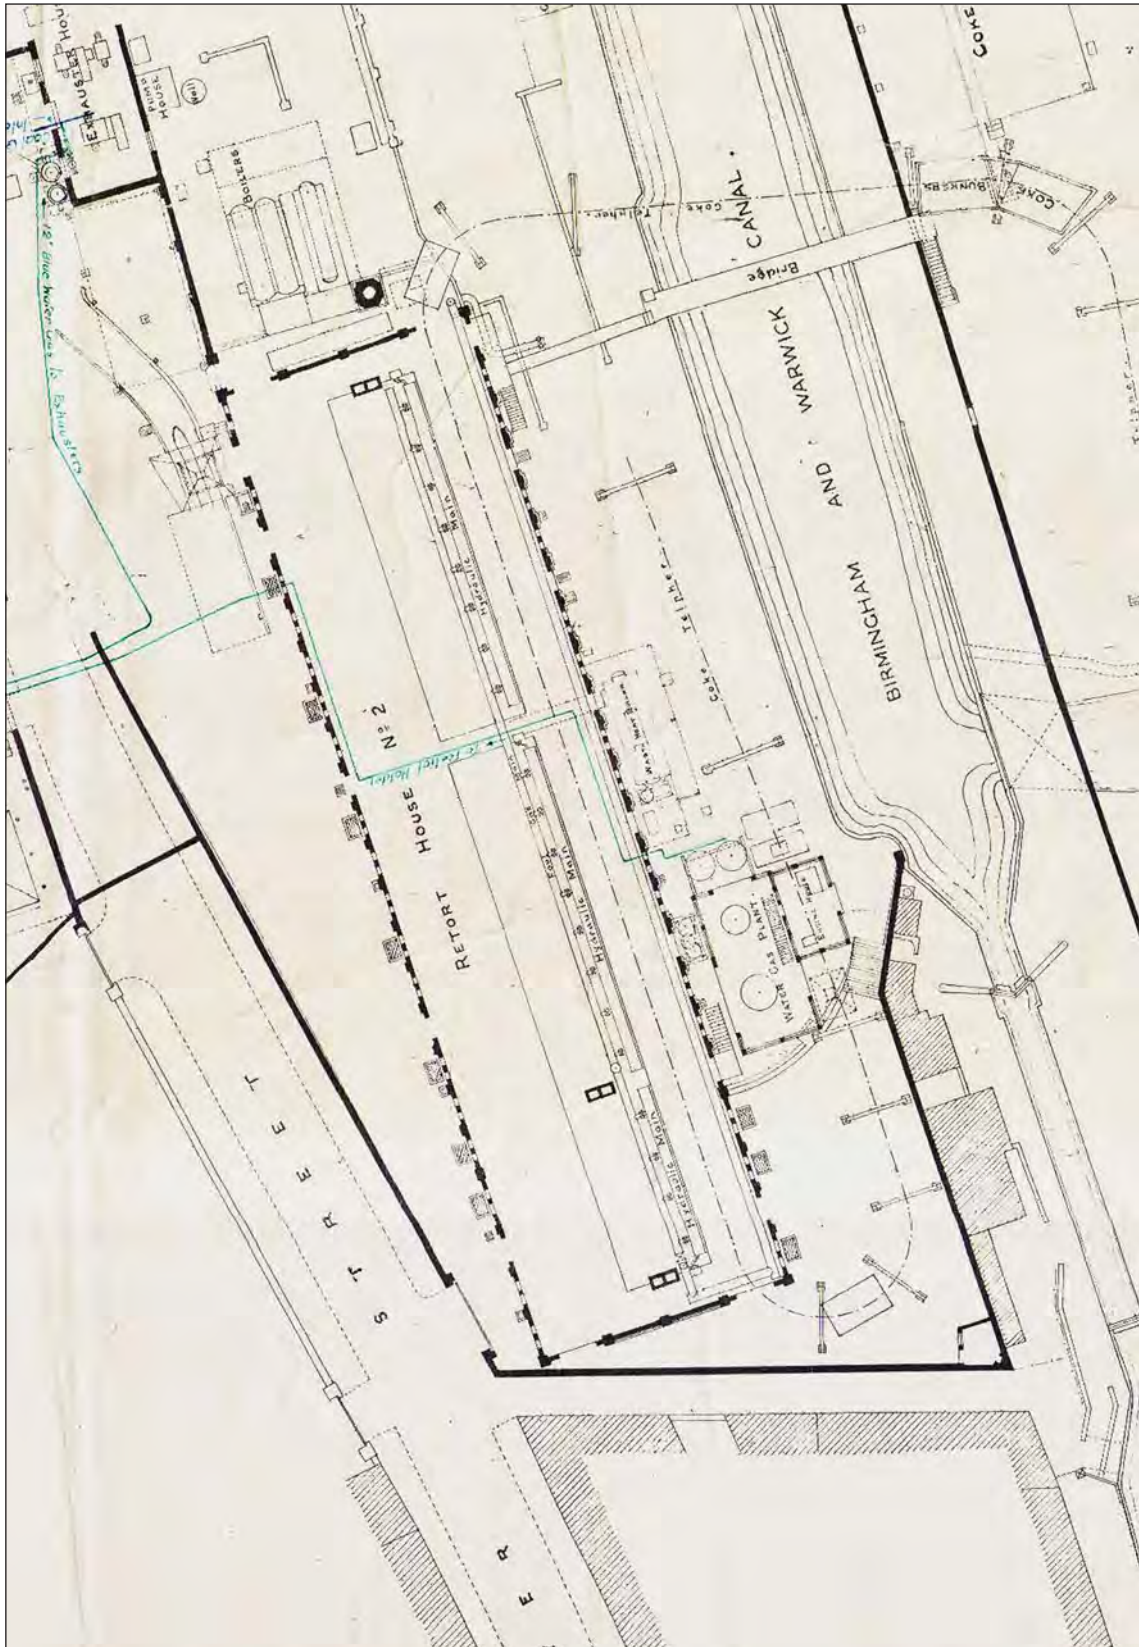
Detail of a 1928 plan of the gasworks, showing the retort house and the water gas plant to the east (National Grid Gas Archive, WM/BIC/ADD/E/E/1)
